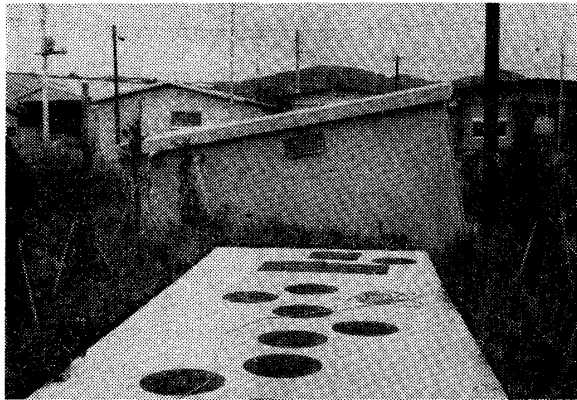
A tilted pumping house and a floated buried sewage treatment tank (Site G-1)
